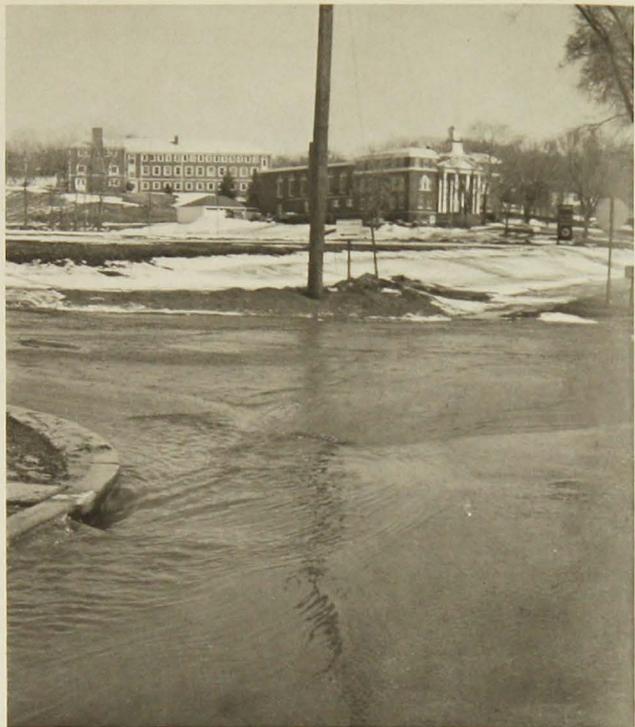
Storm sewers in this area carried heavy 1965 spring runoff and prevented property damage.
